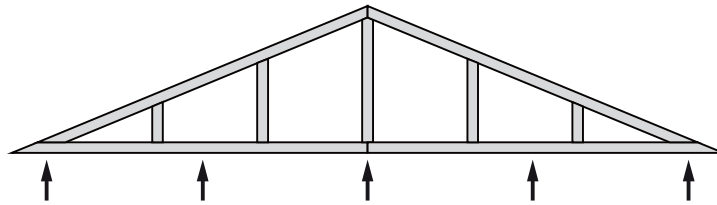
(in part) TYPICAL TRUSS SHAPES
